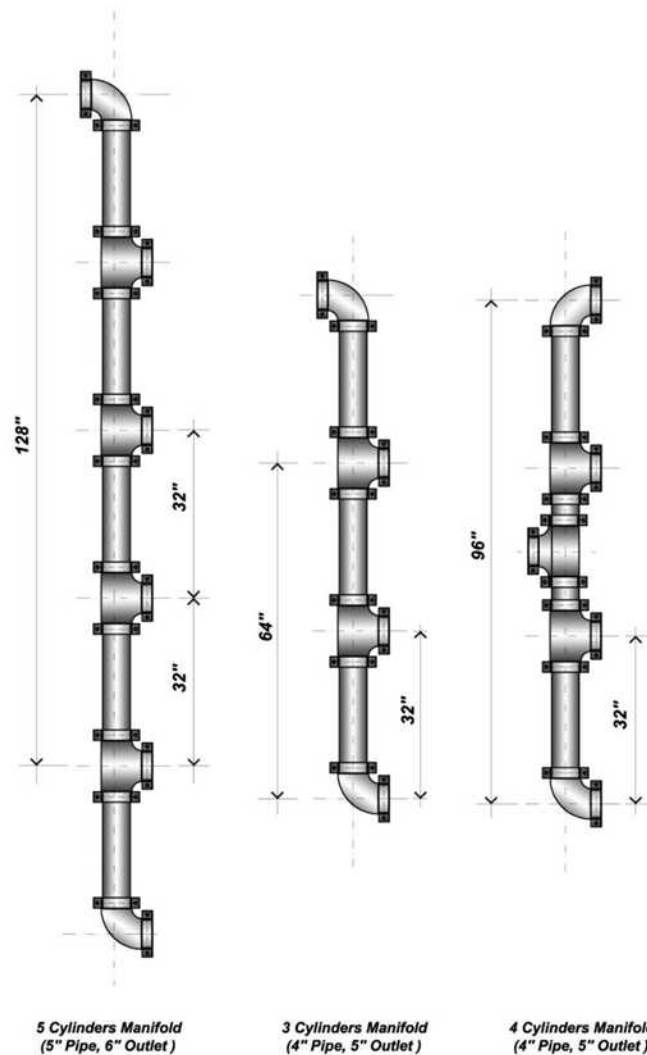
Cylinder Manifolds (Grooved-End Fittings)
